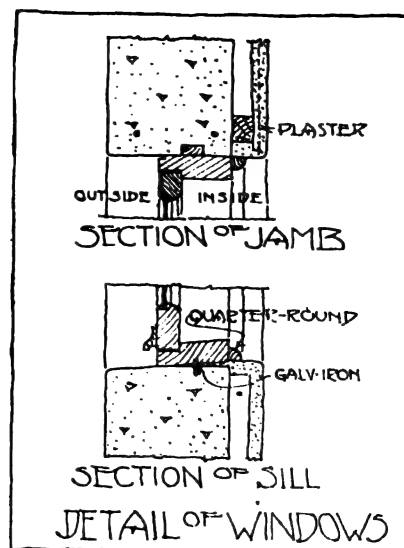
WINDOW DETAILS, PAYSON HOUSE
